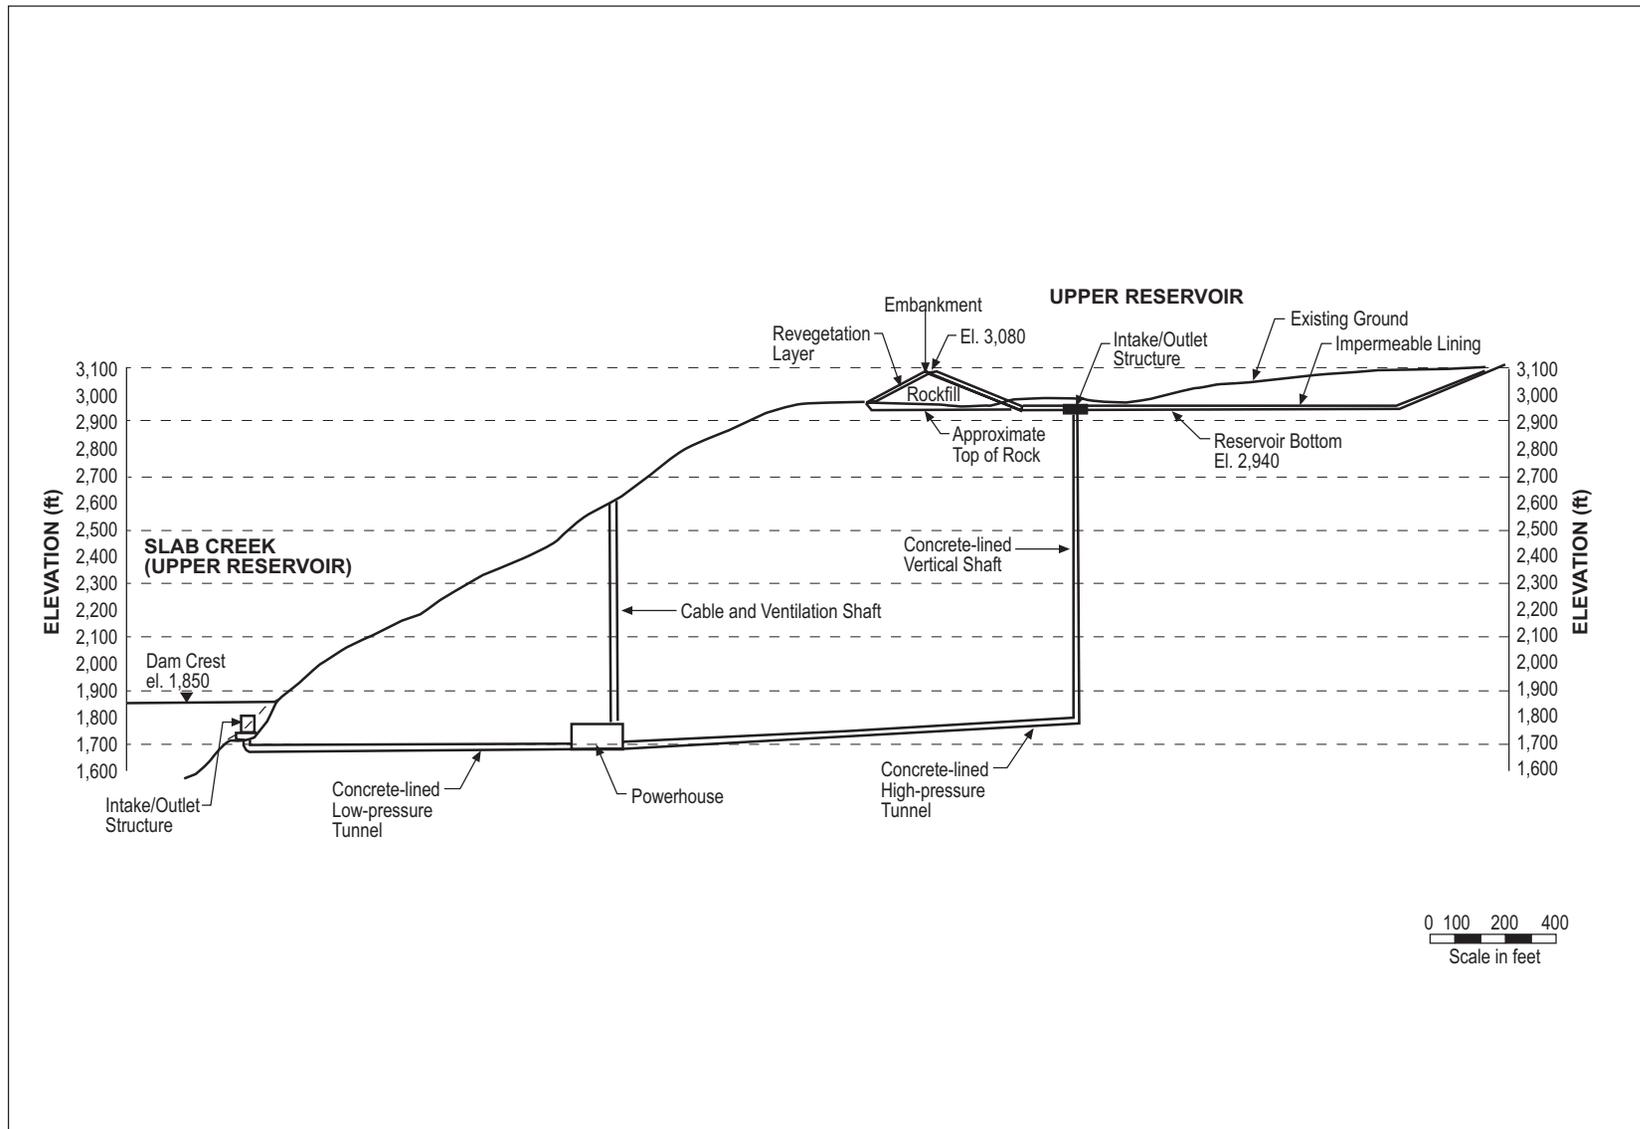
Schematic of the proposed Iowa Hill pumped storage operation. (Source: SMUD, 2005, as modified by staff)
